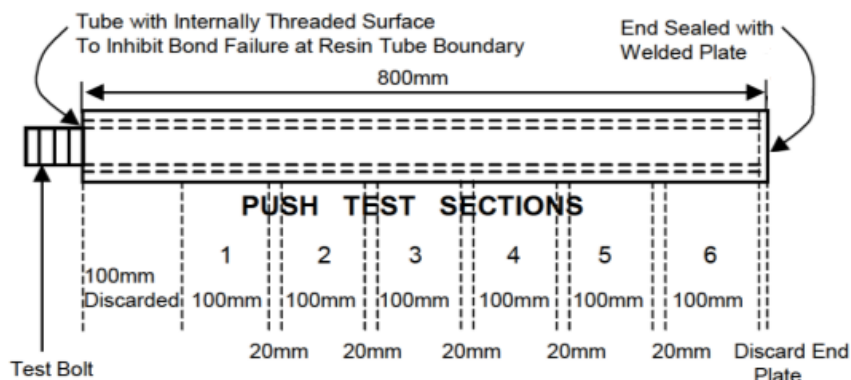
Test bolt and steel pipe section (Altounyan, 2003)
